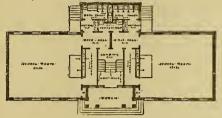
Floor Plan of Two-room Schoolhouse. By Mr. W. Adair Price, Montreal, P. Q.
